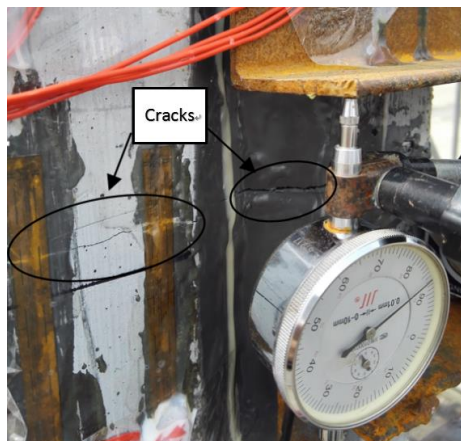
Cracking diagram of precast pillar loaded to 2 load level
